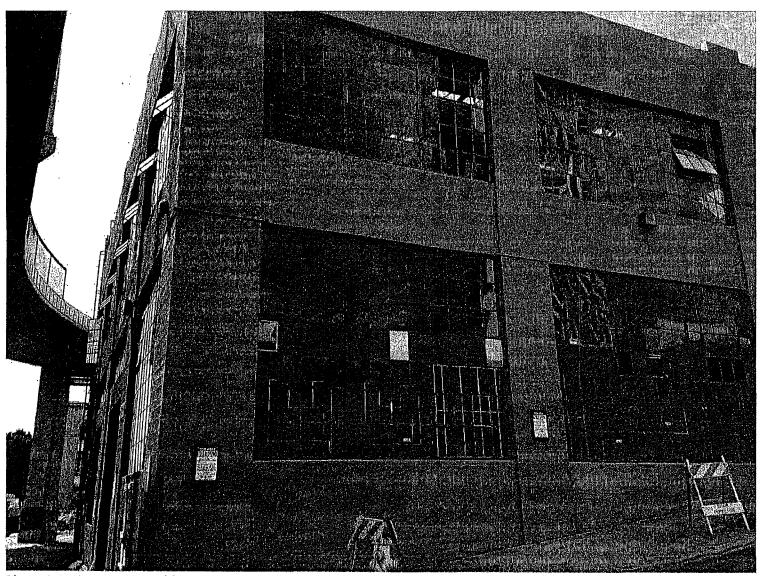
Project site viewed from Rincon Street, just north of Bryant Street, looking west. Westbound I-80 Harrison Street off-ramp viaduct is visible in the upper left. – March 28, 2014
